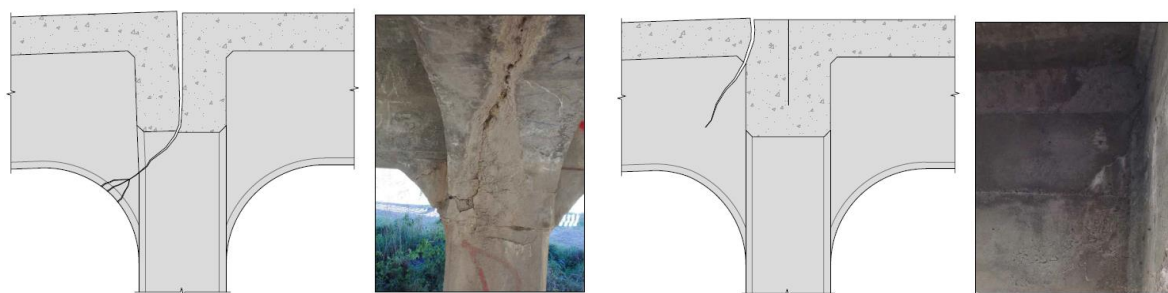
Critical joint failure mechanisms and examples of similar cracking on site
